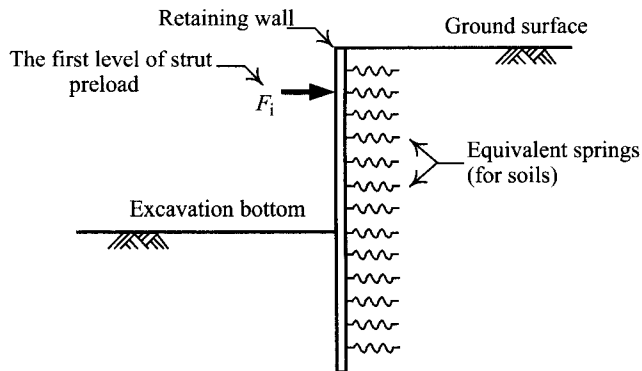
Wall acted on by strut preload as beam on elastic foundation beam.
